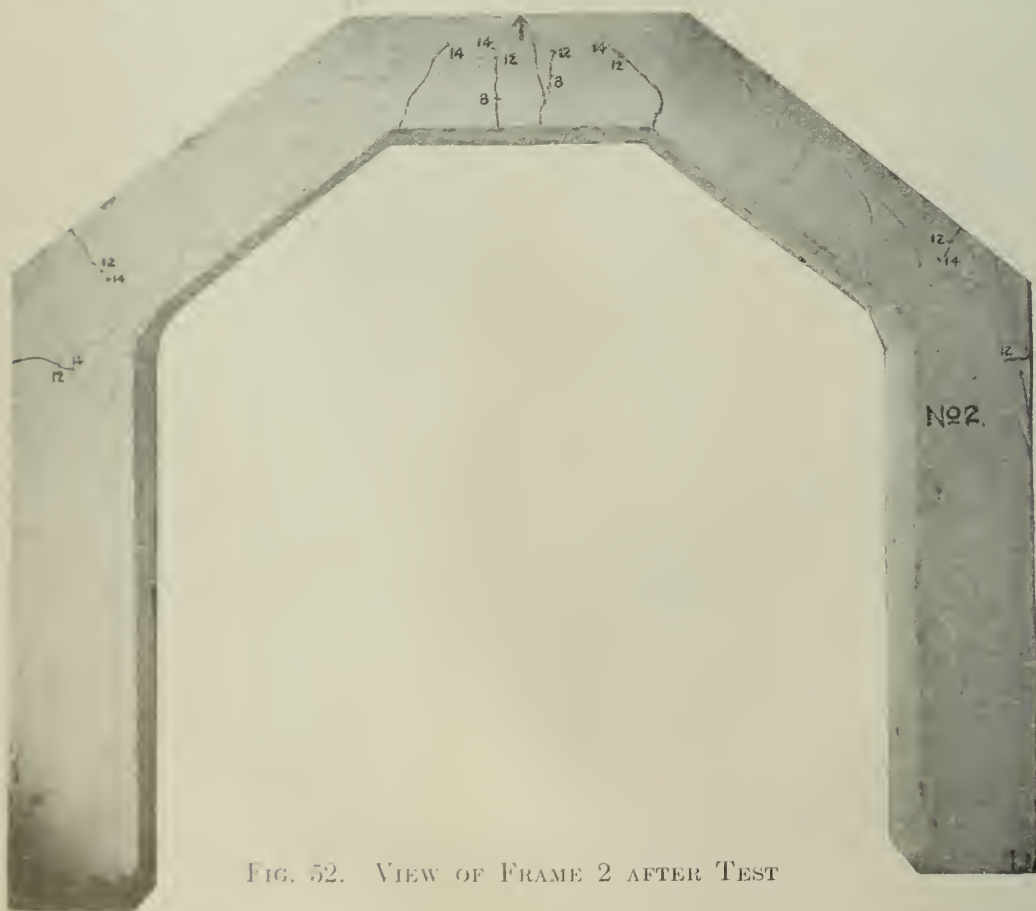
VIEW OF FRAME 2 AFTER TEST
